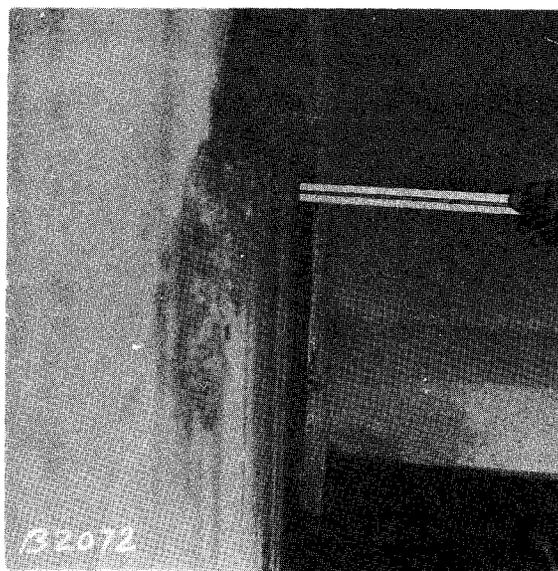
Edge view of abutment wall faulting due to pavement growth.
